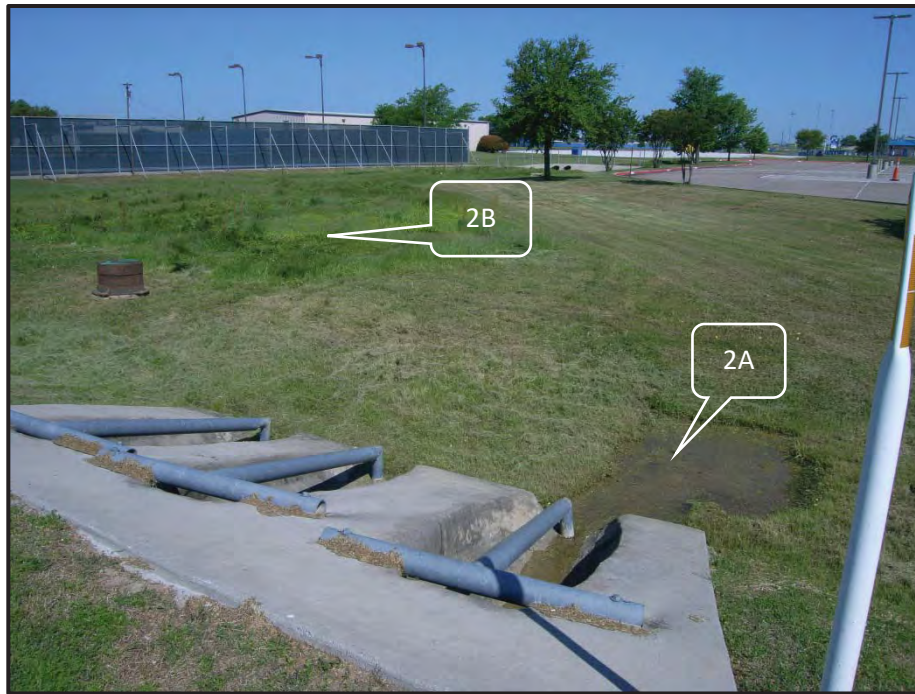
View looking north toward Crossing 1 – Jordan Creek (intermittent stream).
